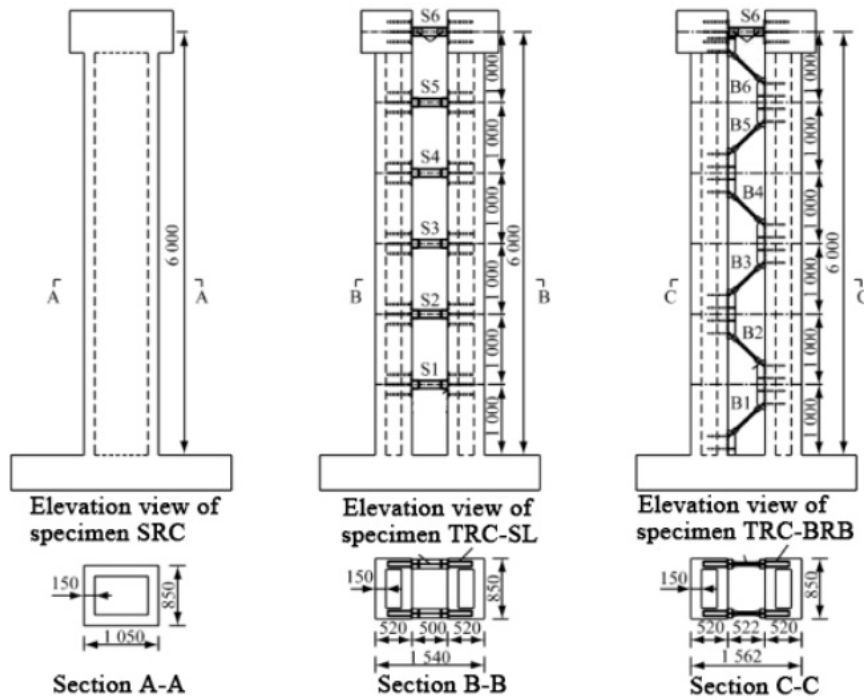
Section and Elevation View of Specimen (Unit: mm).
